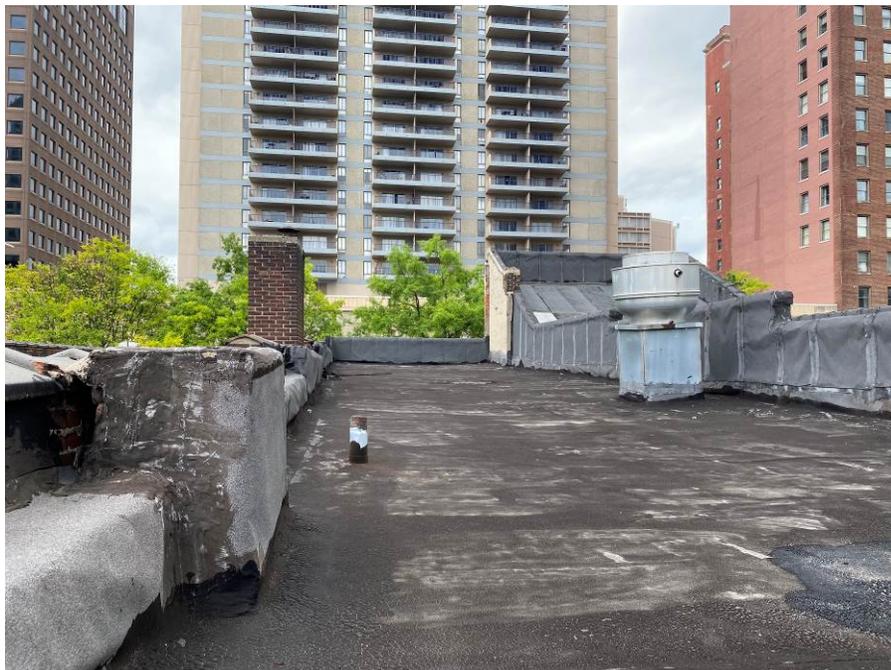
Aged Roof Coverings at 86 North Main with Gaps and Openings
